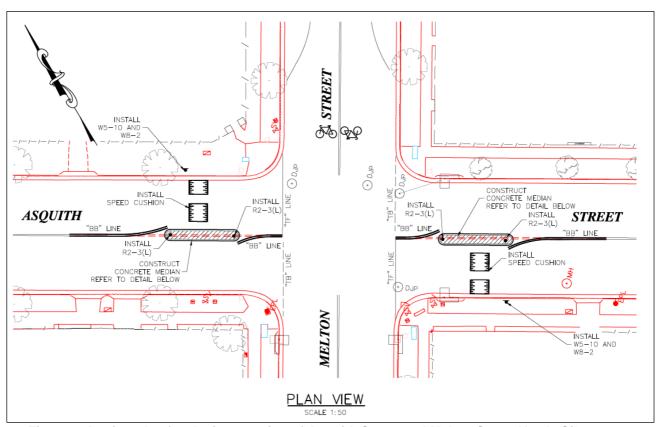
Design plan for the intersection of Asquith Street and Melton Street North, Silverwater
